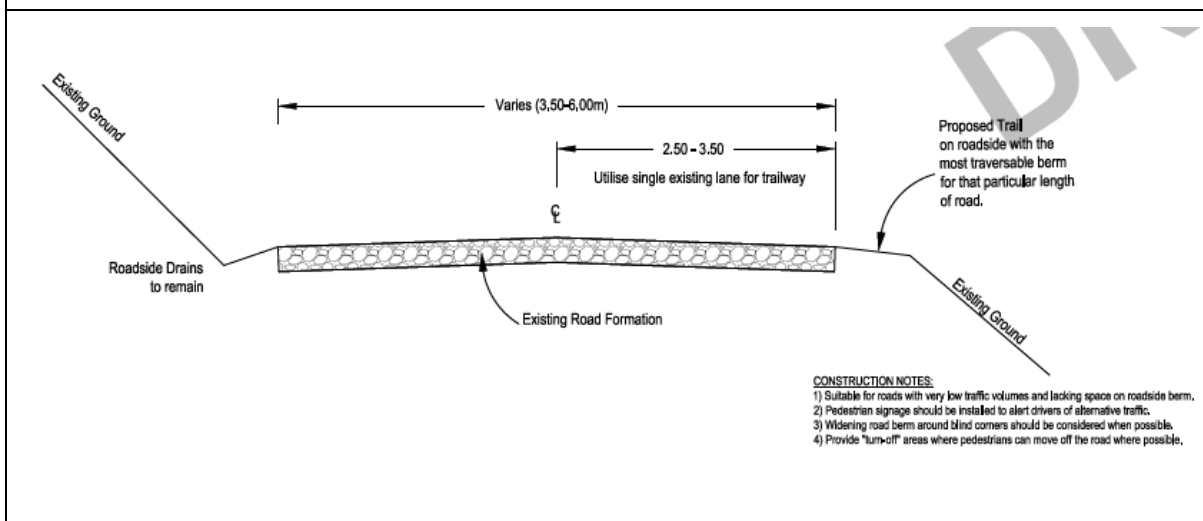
Typical Trail Cross-section 11: Low-volume road, utilising existing road carriageway
